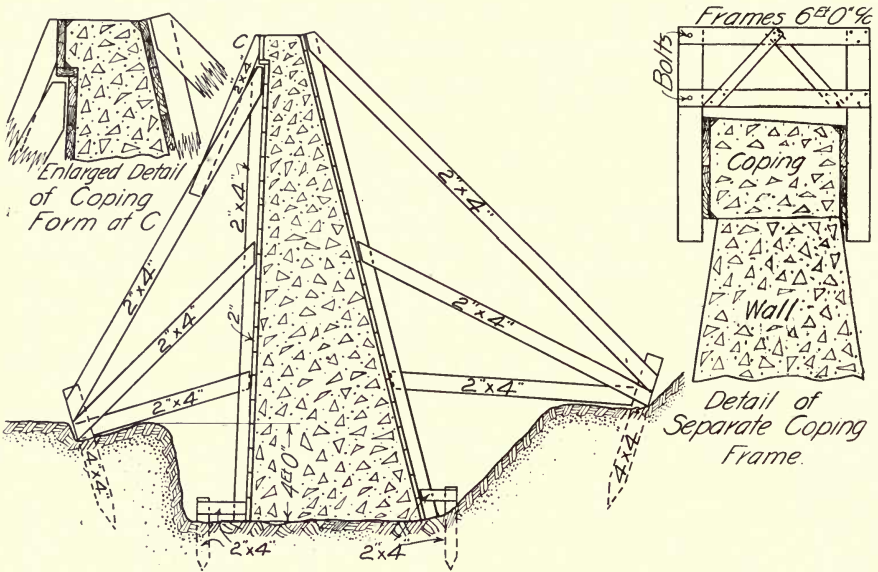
FORMS FOR GRAVITY RETAINING WALL
